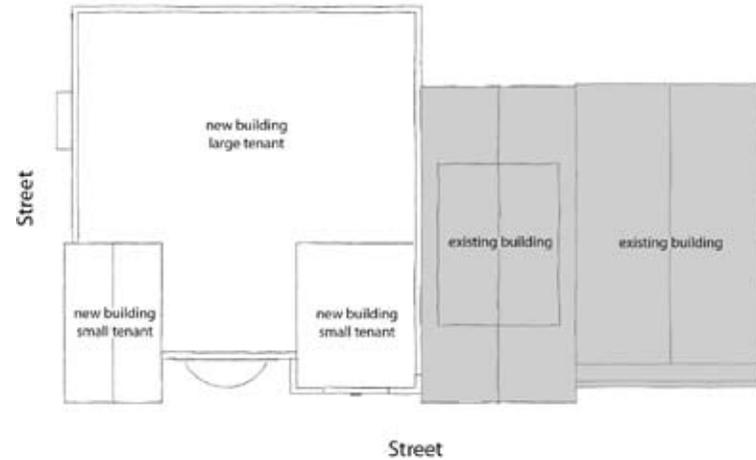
The above plan illustrates how a large building (on the left, unshaded) could be designed with smaller tenant spaces fronting on the street. The proportions of these smaller tenant facades match those of the existing buildings on the street (on the right, shaded). The perspective sketch below shows how the smaller tenant spaces screen the bulk of the larger tenant space behind and contribute to the village streetscape.
